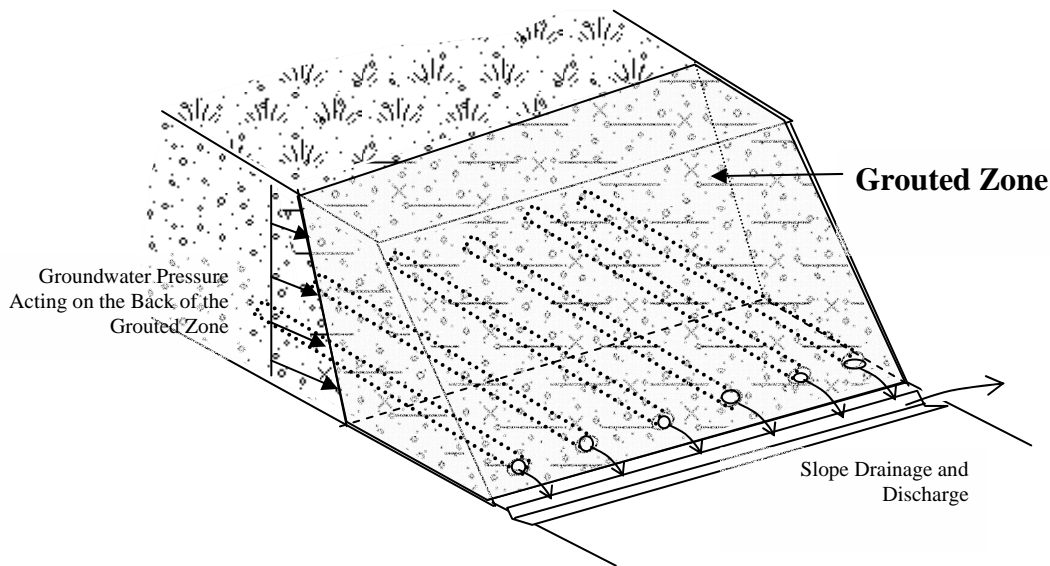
Grout stabilised soil section with drainage relief boreholes
